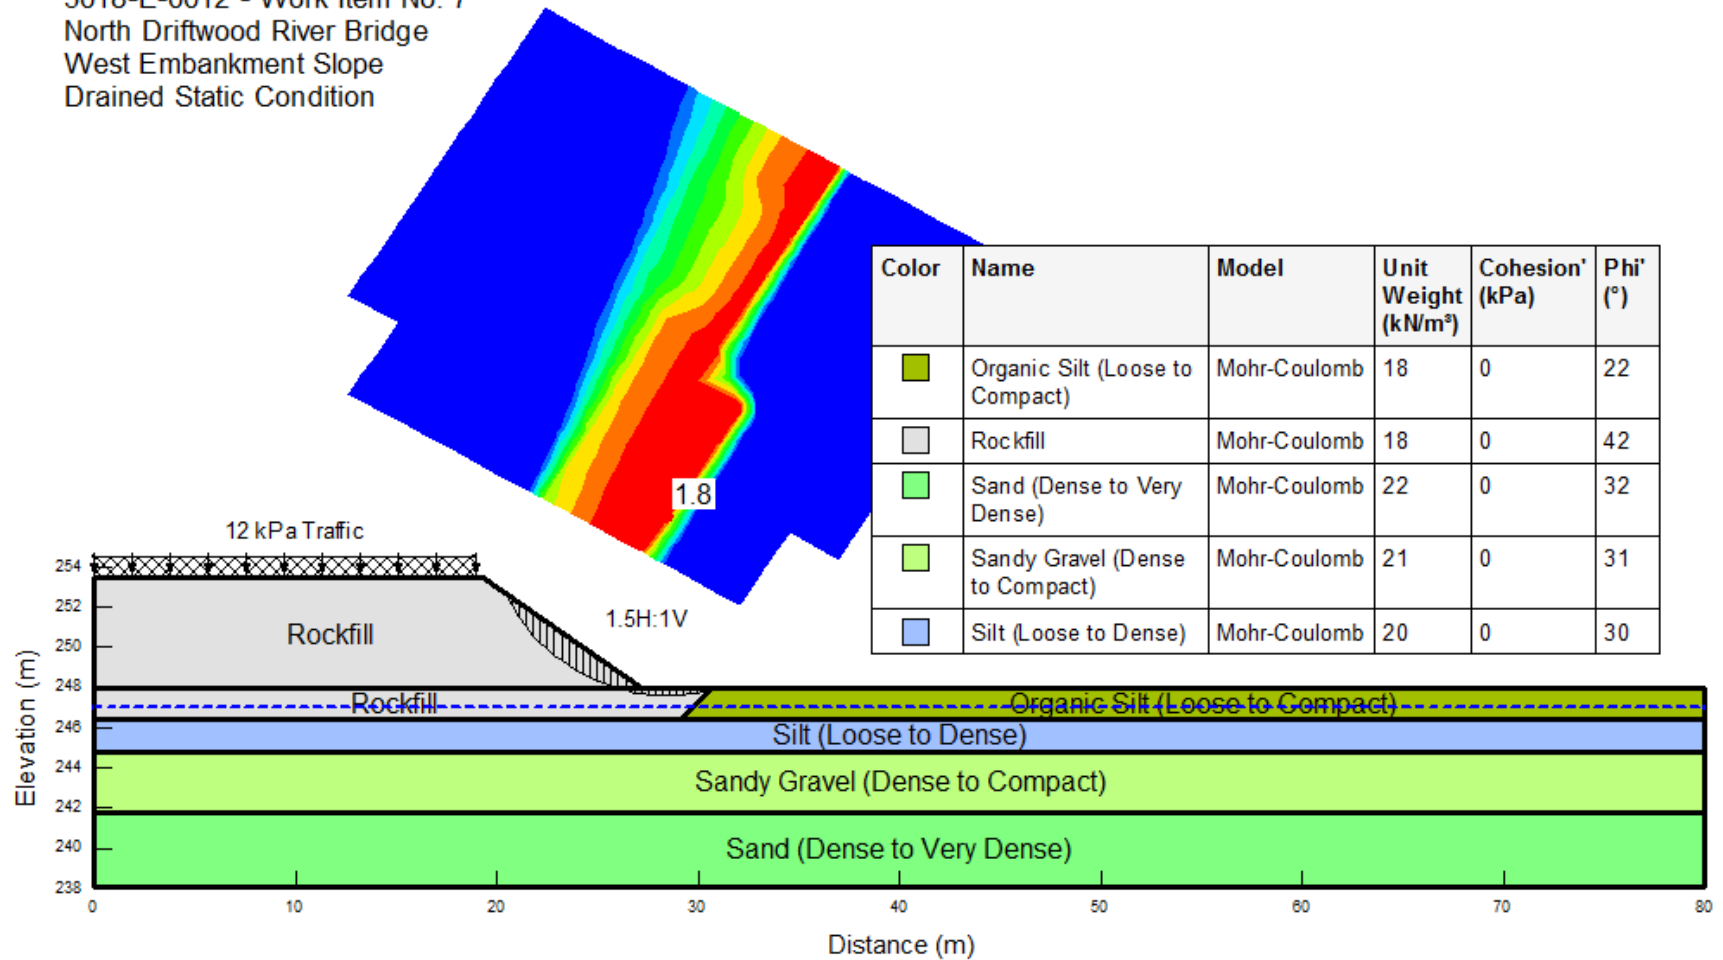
Slope stability analysis for west approach embankment – drained static condition
